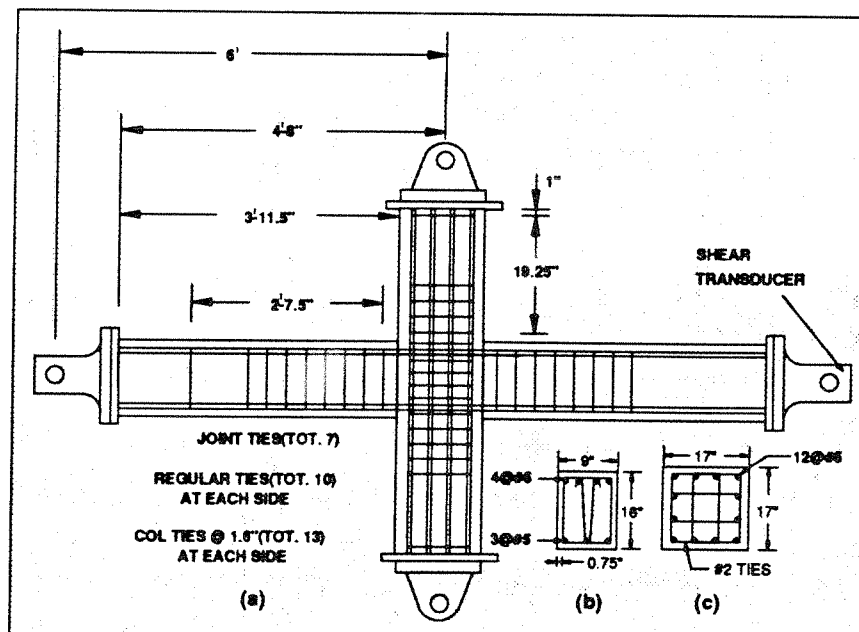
Geometry and Reinforcing Details of Beam to Column Subassembly
